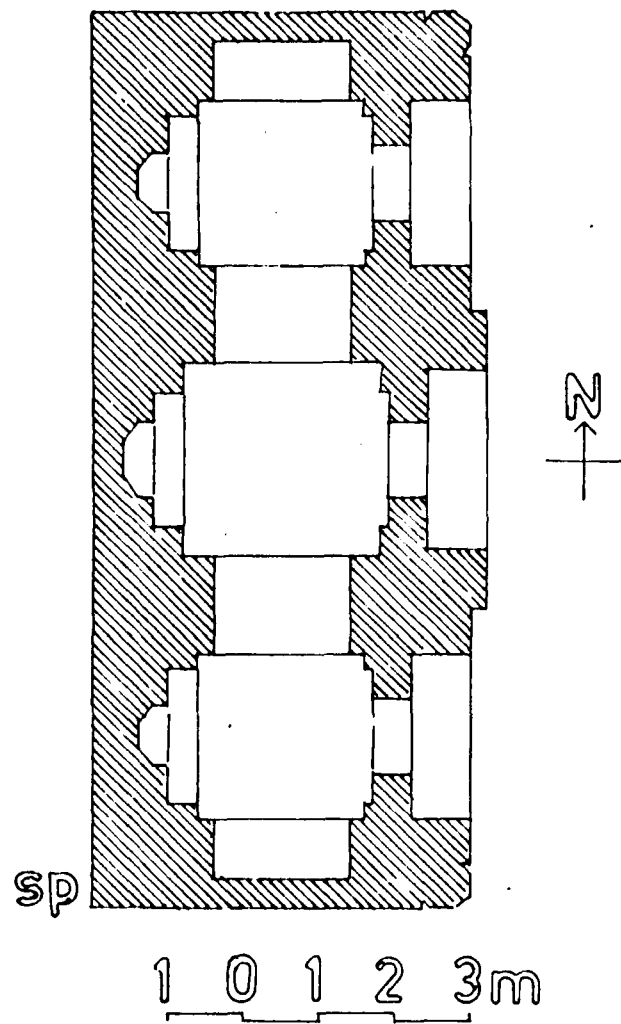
Fig. LI. Bahadurgarh : Fort, plan of the main gateway
